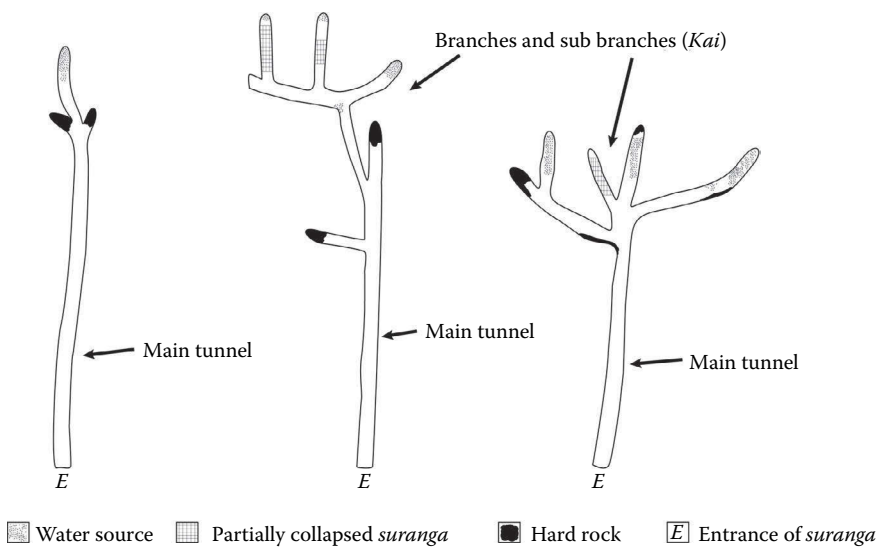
The plan view of *suranga* illustrating the use of *kai*.
